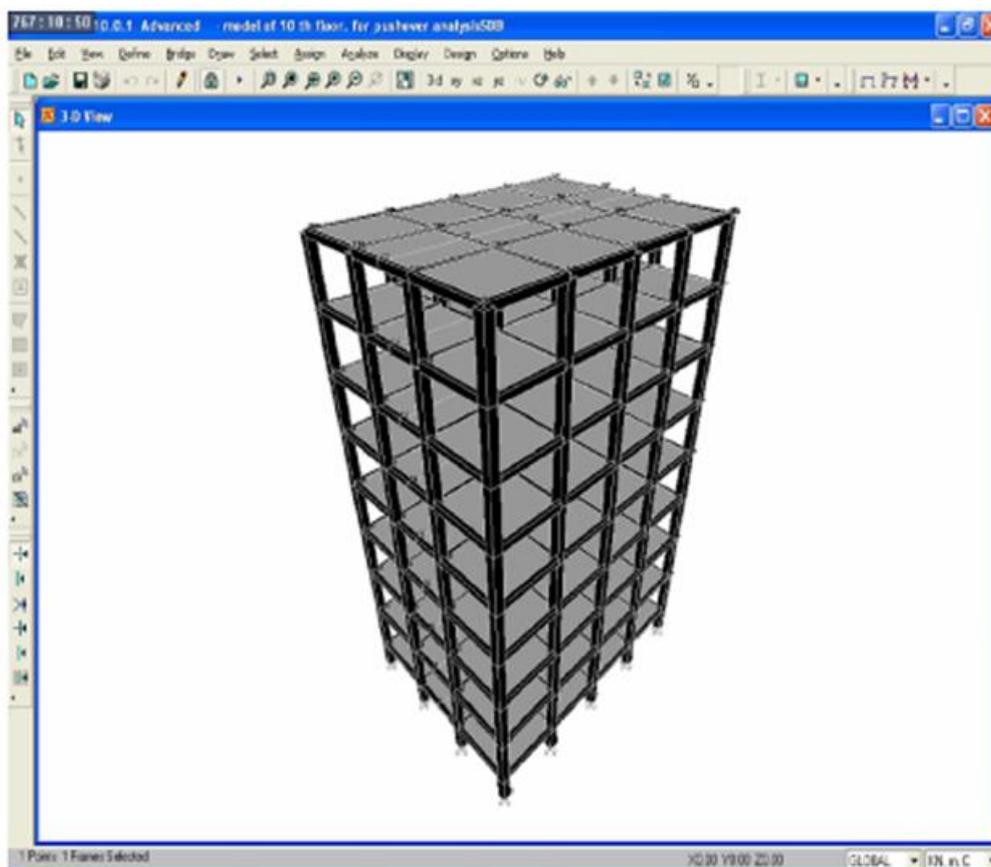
3-D view of the eight storey building (G+8) created in SAP2000
